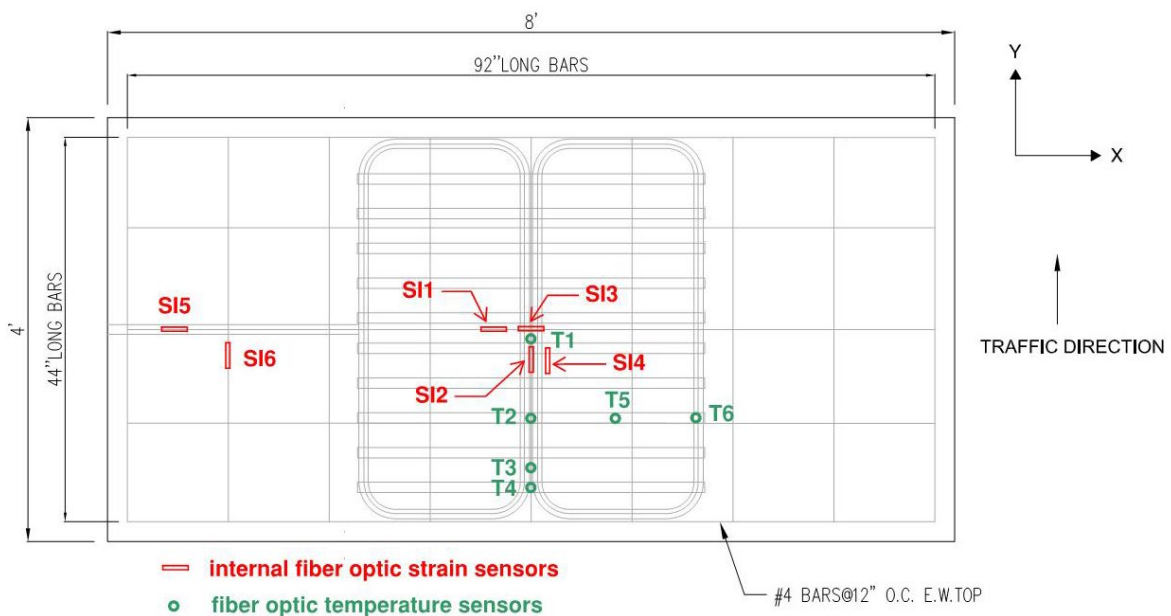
Instrumentation plan for typical panels – top mat of reinforcement, plan view
